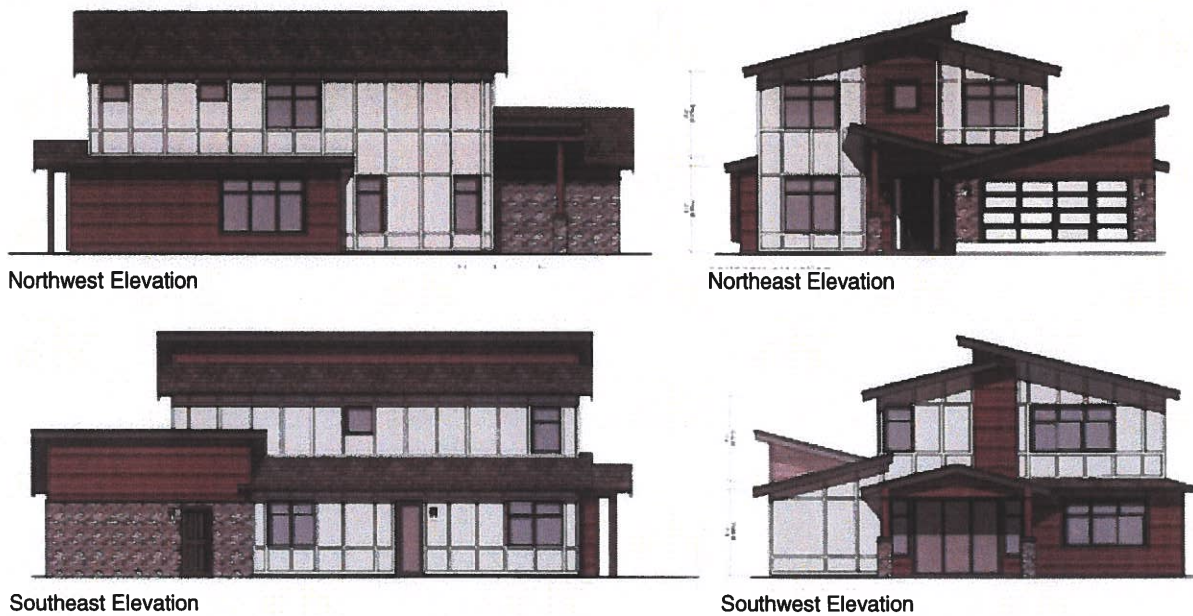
Proposed (Revised) Elevations – Proposed Lot 1 (from plans by Outline Home Design)
